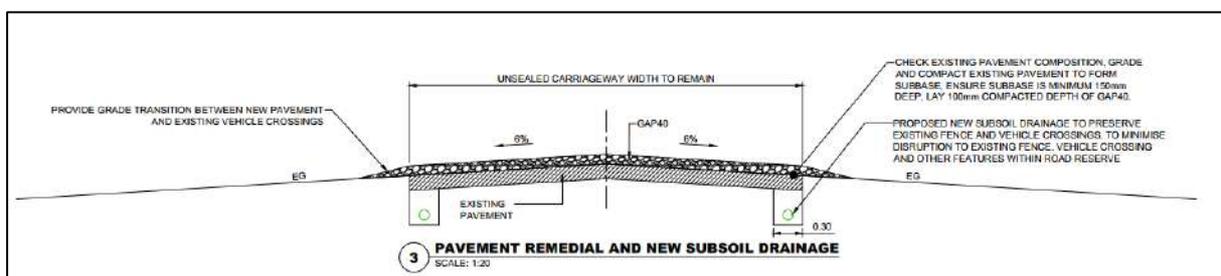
Typical Road Upgrade (On ridgeline, free draining either way)
